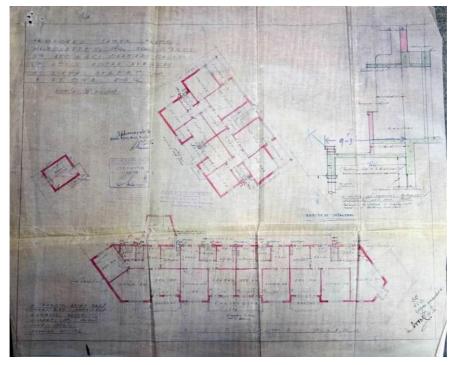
Floor plans for proposed shops, flats and maisonettes on Stand 450, Orange Grove from 1936
